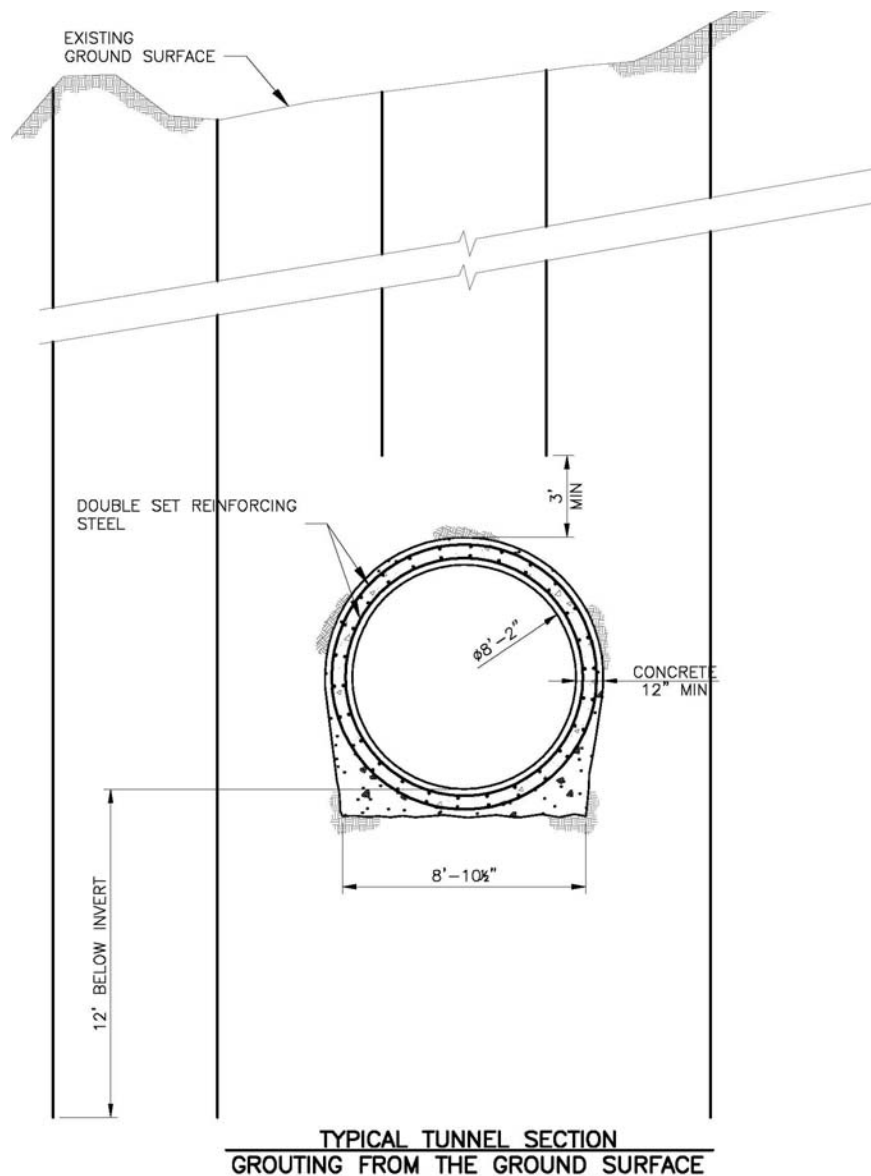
Tunnel Cross Section Showing Grout Holes from the Surface
